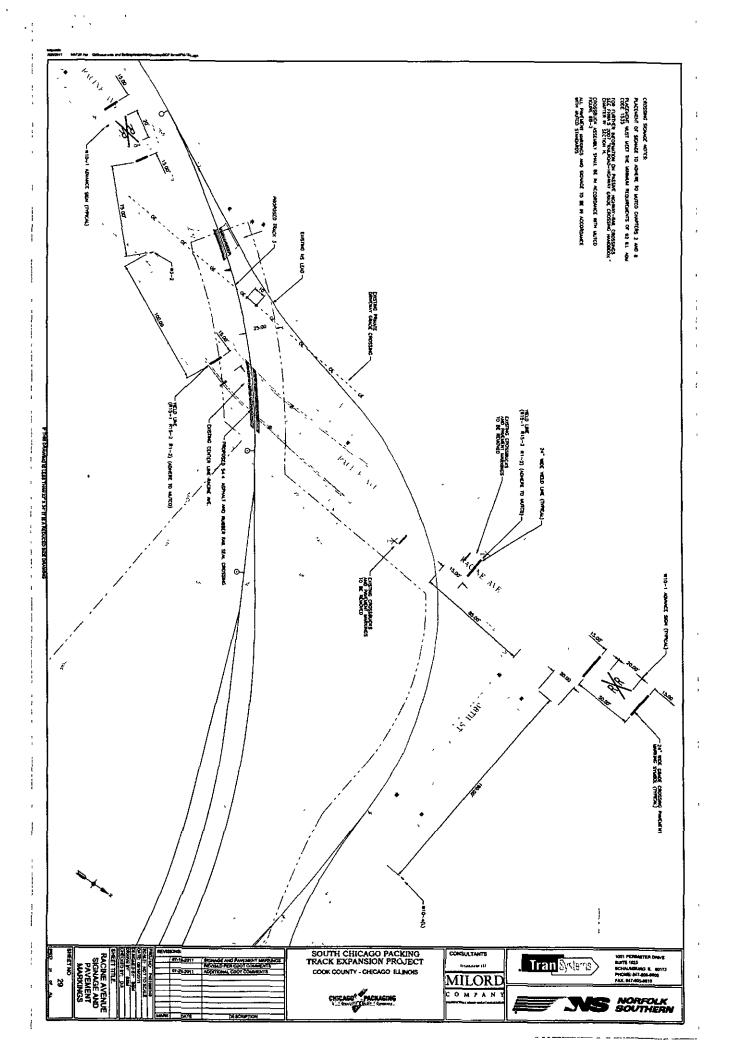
EXHIBIT F DEPICTION OF RACINE AVENUE SLOPE ALIGNMENT AREA
